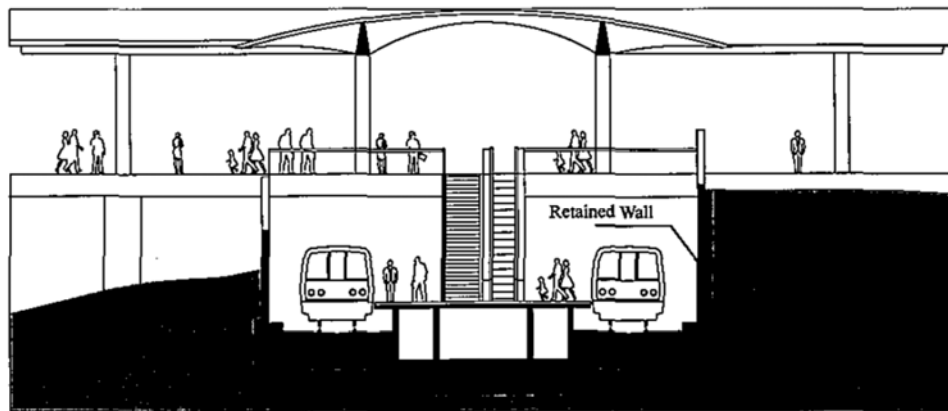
Schematic section of a retained cut station type showing the elevated mezzanine, platform and the retaining wall (Griffin, 2004).
